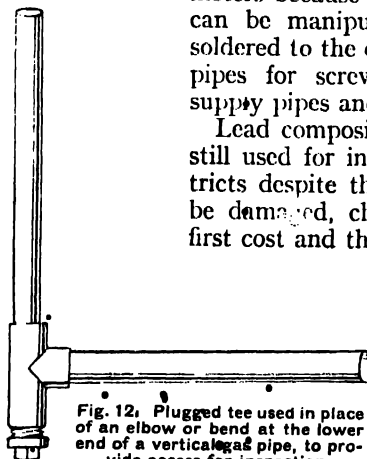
Plugged tee used in place of an elbow or bend at the lower end of a vertical gas pipe, to provide access for inspection.
